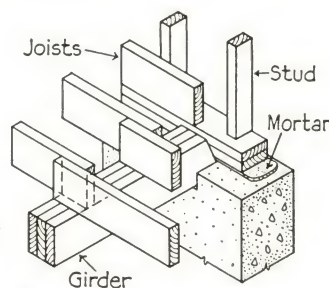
FRAMING JOIST ON TOP OF GIRDER
